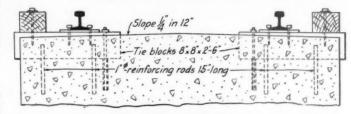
Track Construction in the Bergen-Hill Tunnel
